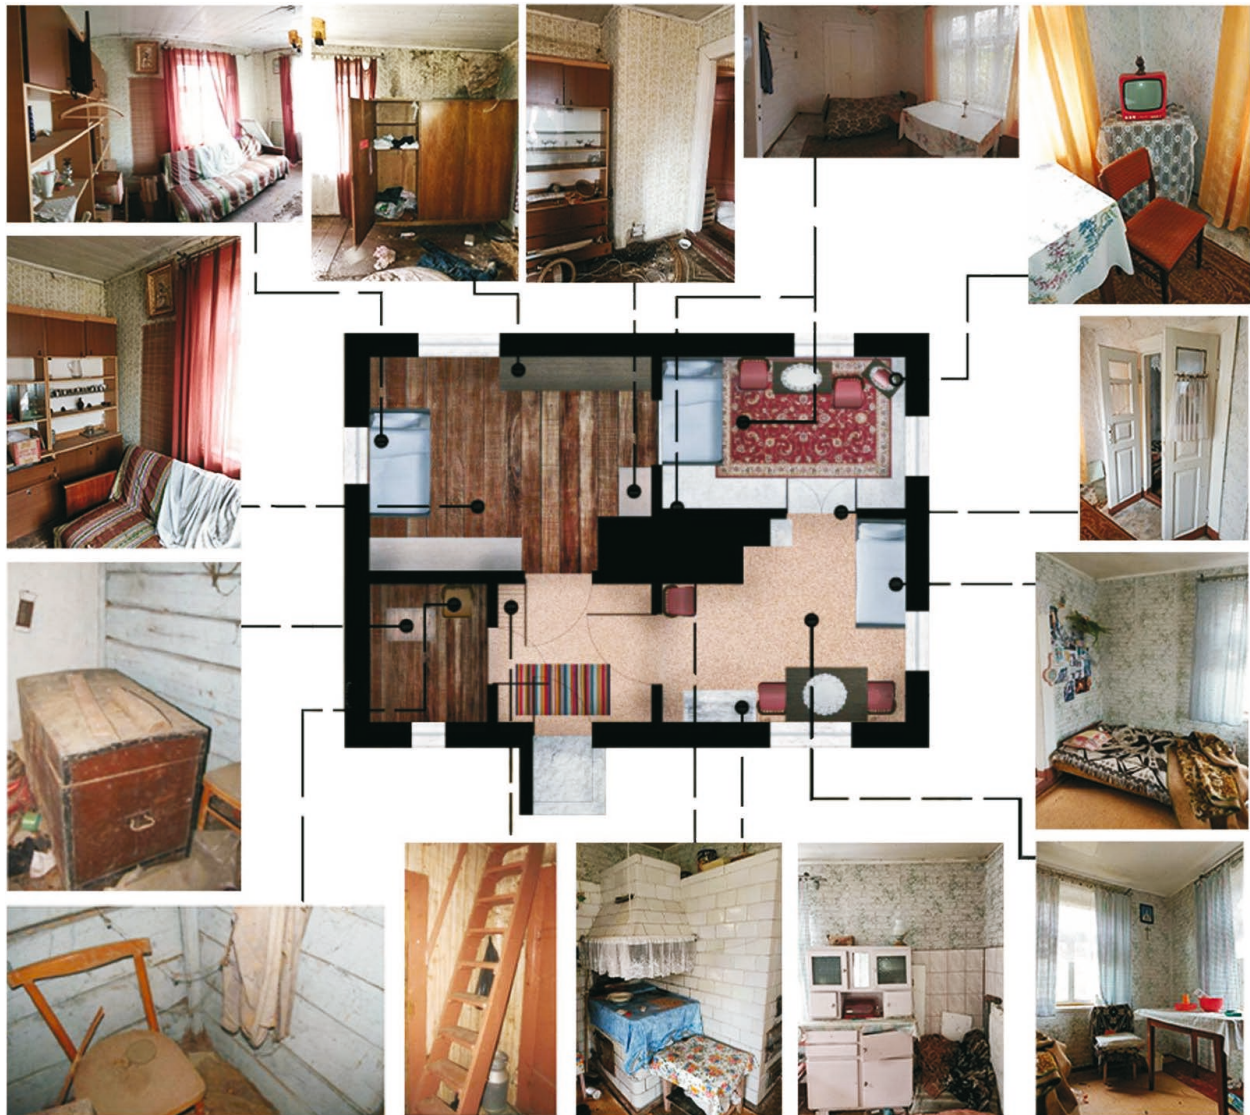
Schematic section drawings with home furniture; source: the authors, 2022
